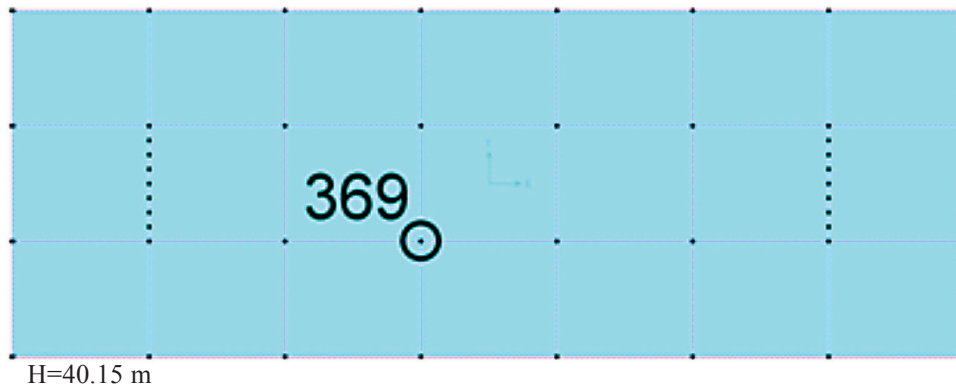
Joint placed as close as possible to the centre of the structure – maximum level, toward the area where the structural elements are eliminated.
